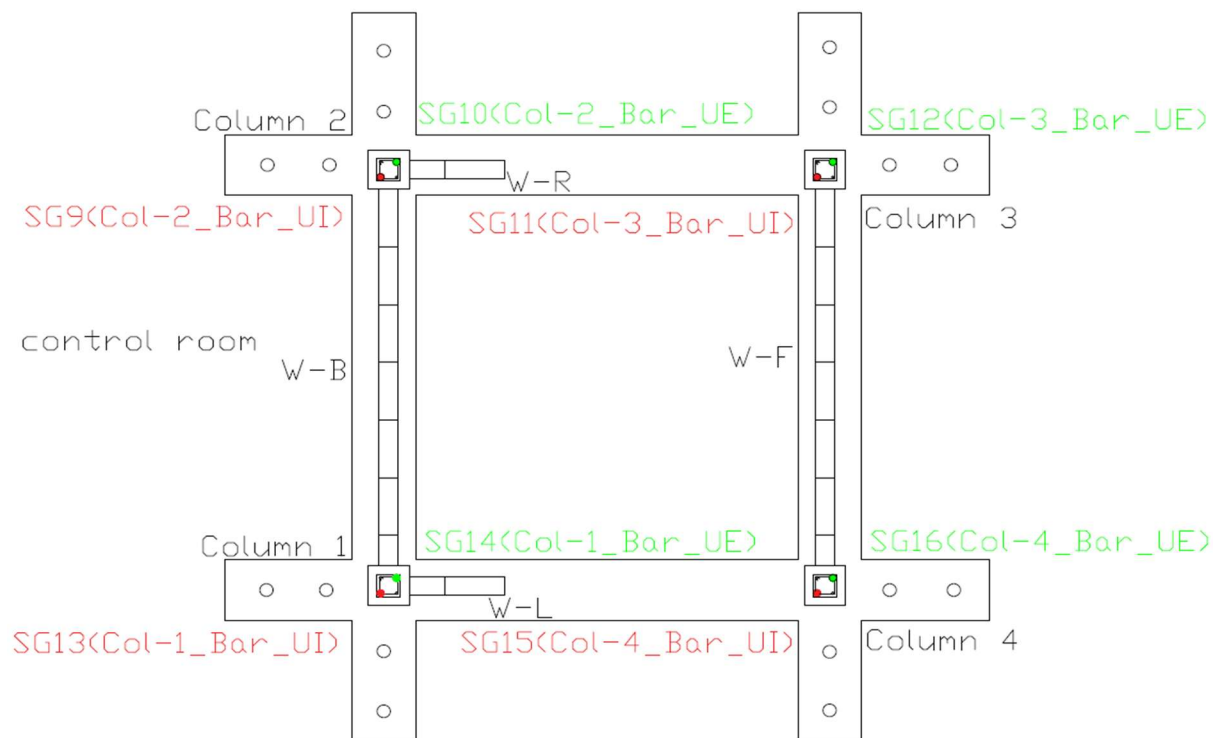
Floor plan with strain gauges at the top of the columns (UE)
